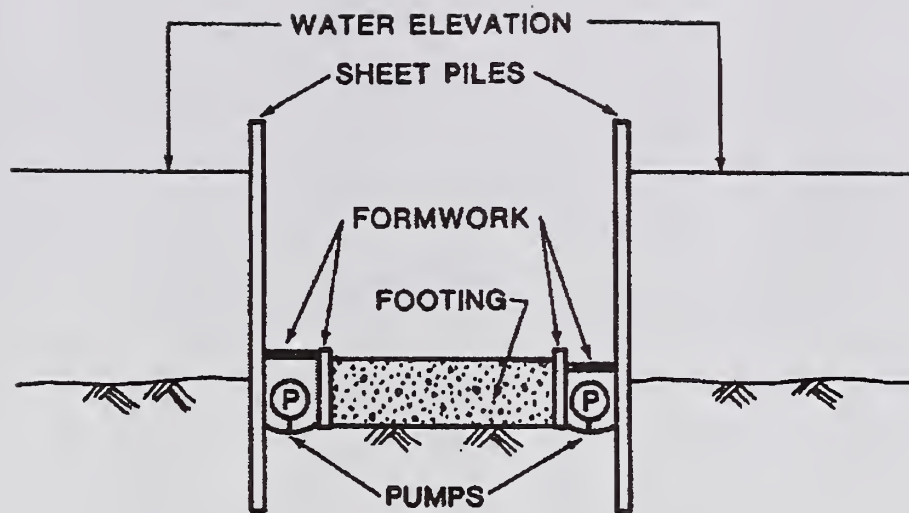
Water flow between footing formwork and cofferdam wall.
